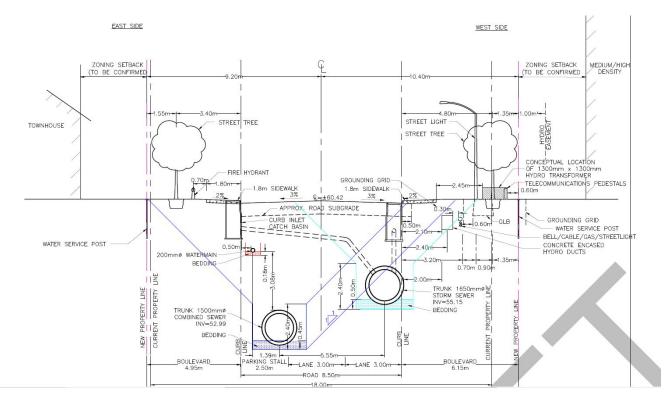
Residential Road 18.0 metre right-of-way concept design.
